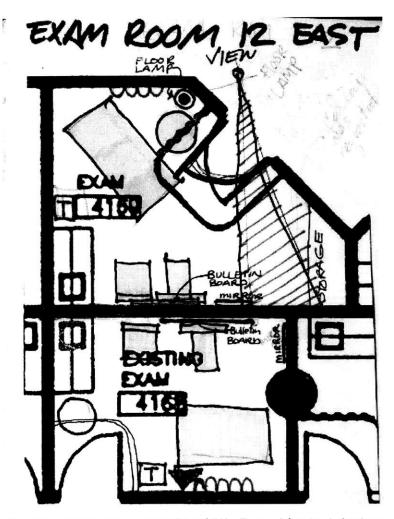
Drawing of exam room #6 and #12. Focus of drawing is furniture layout, shape of space and view corridor.
